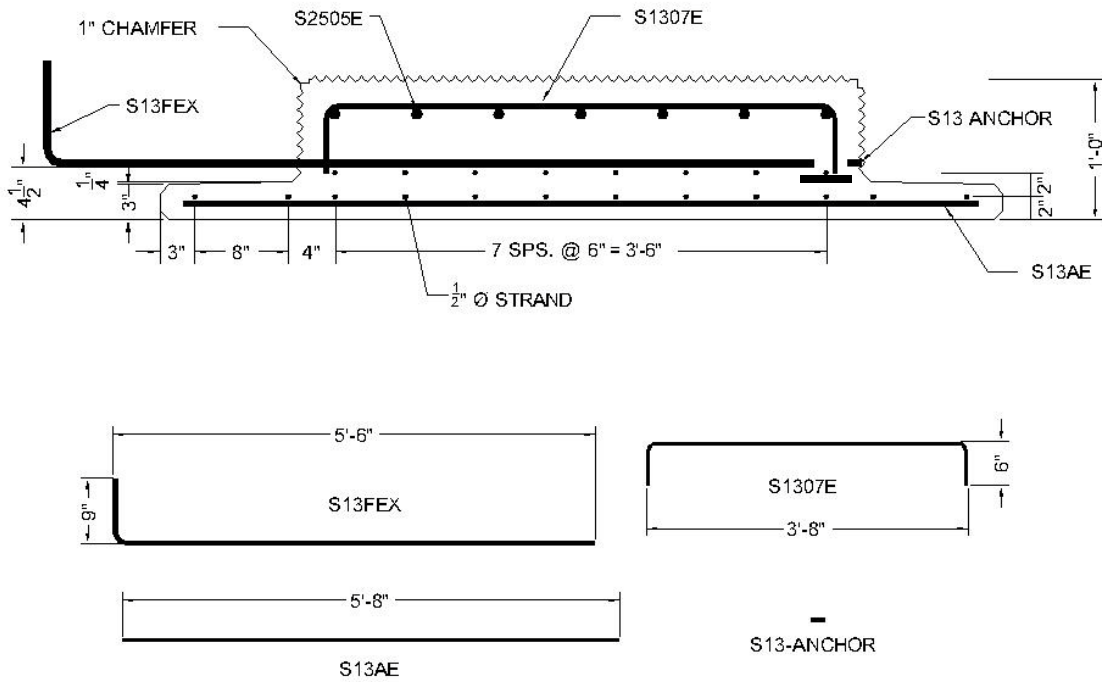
Cross section and individual reinforcement details for the west end of the precast beams 1N and 1S in the Concept 2 laboratory bridge specimen
